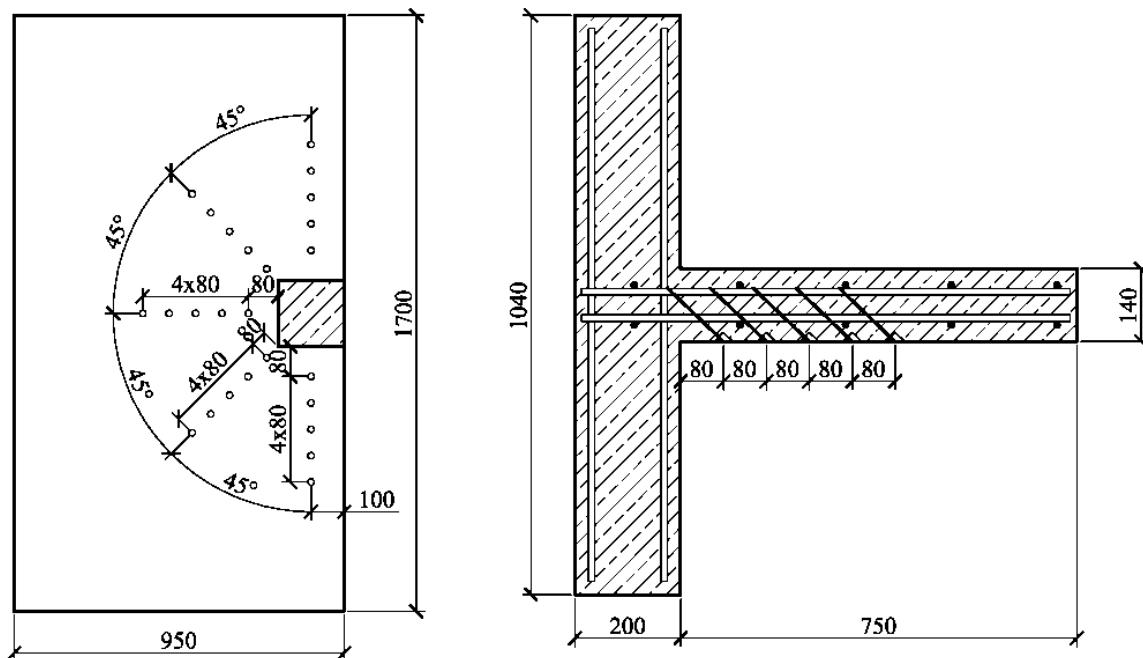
Scheme of transverse reinforcement installation in the near-column area (plan view).
